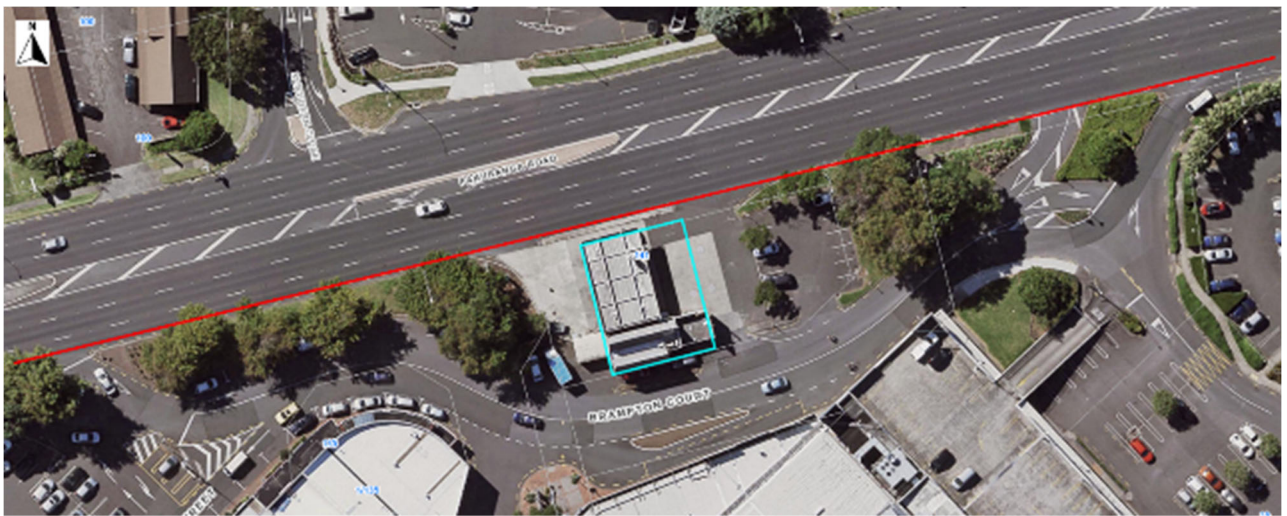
Pakuranga Rd longitudinal drainage works and GAS service station (blue outline)
